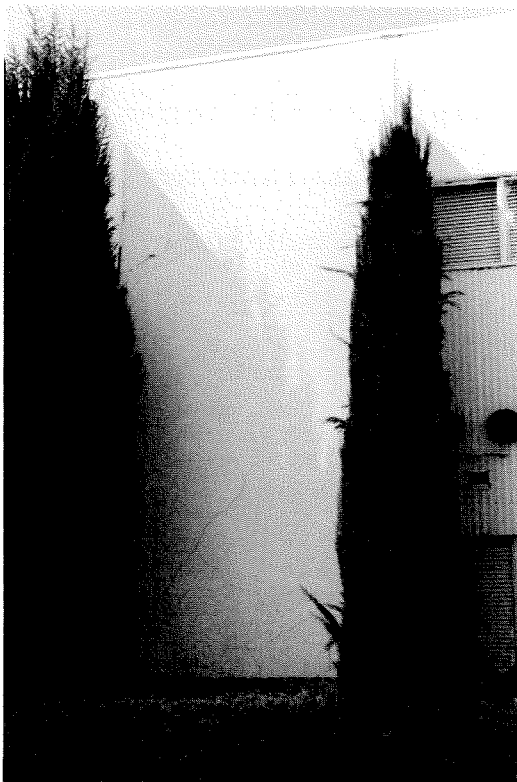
Cracked wall, front face of International Telephone and Telegraph western building, Bledsoe Street.
